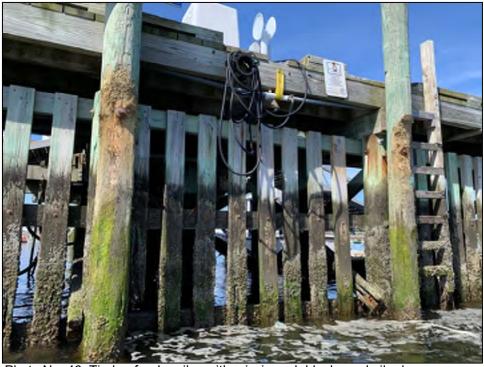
Timber fender piles with missing rub blocks and pile damage.
